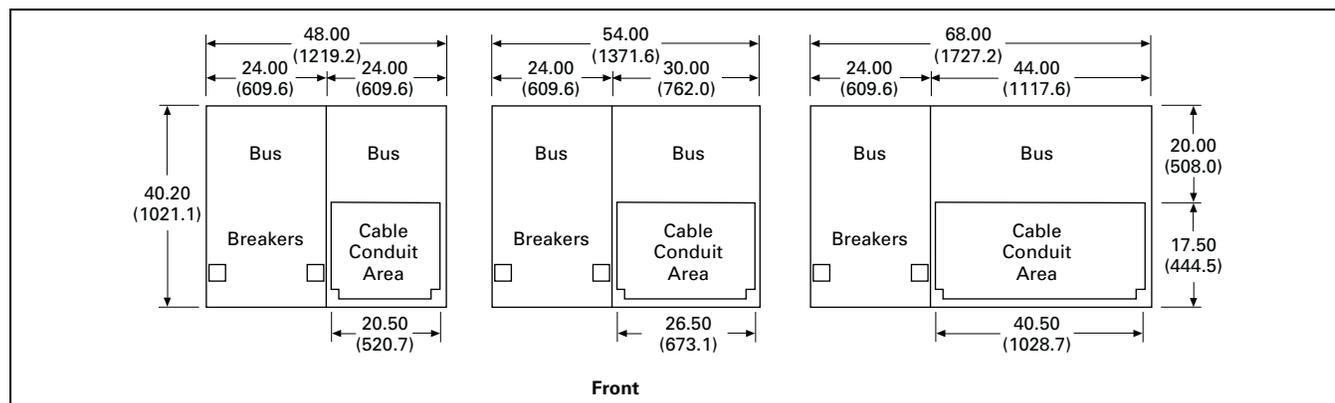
Floor Plans and Available Conduit Space in Inches (mm)—Front-Access Structures
